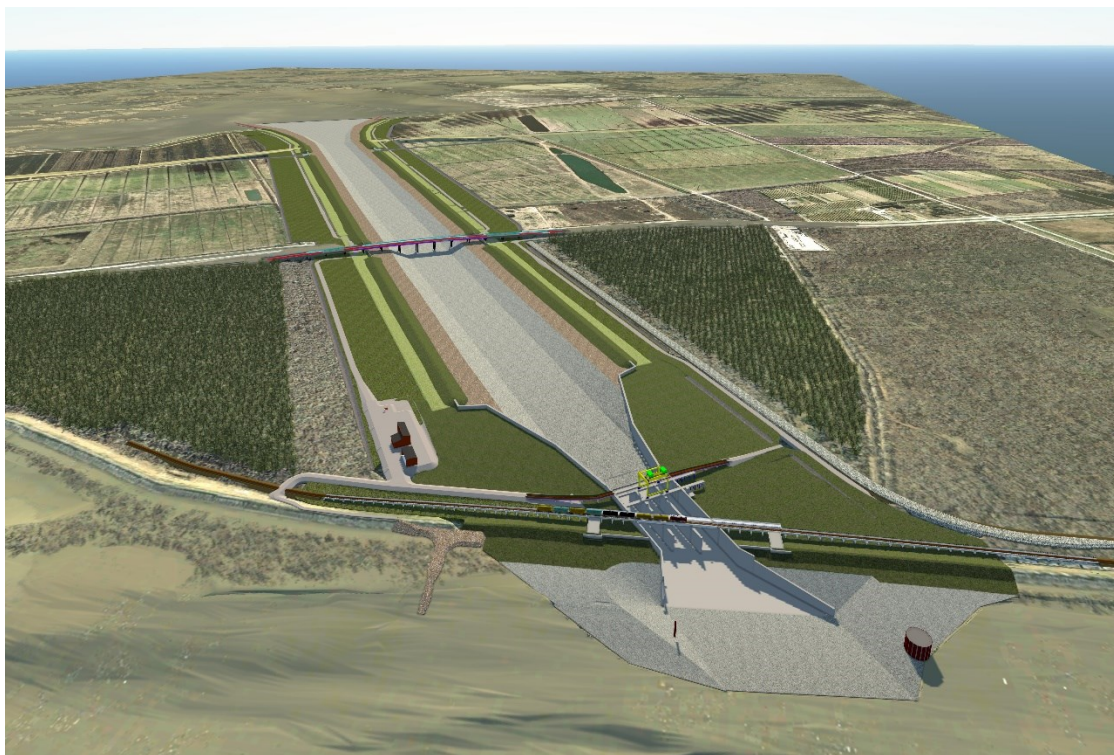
Schematic Rendering of the Proposed LA 23 Bridge over the Proposed Diversion Channel.
